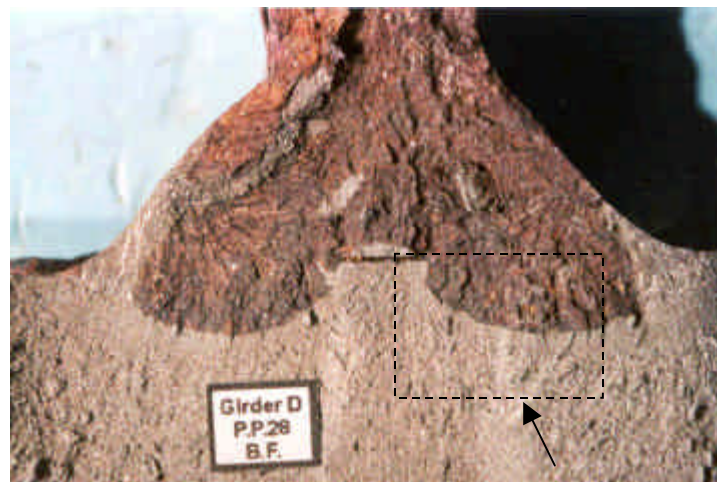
Etched Cross-Section Through Thumbnail Defect at Fracture Origin (Girder B P.P. 26)
